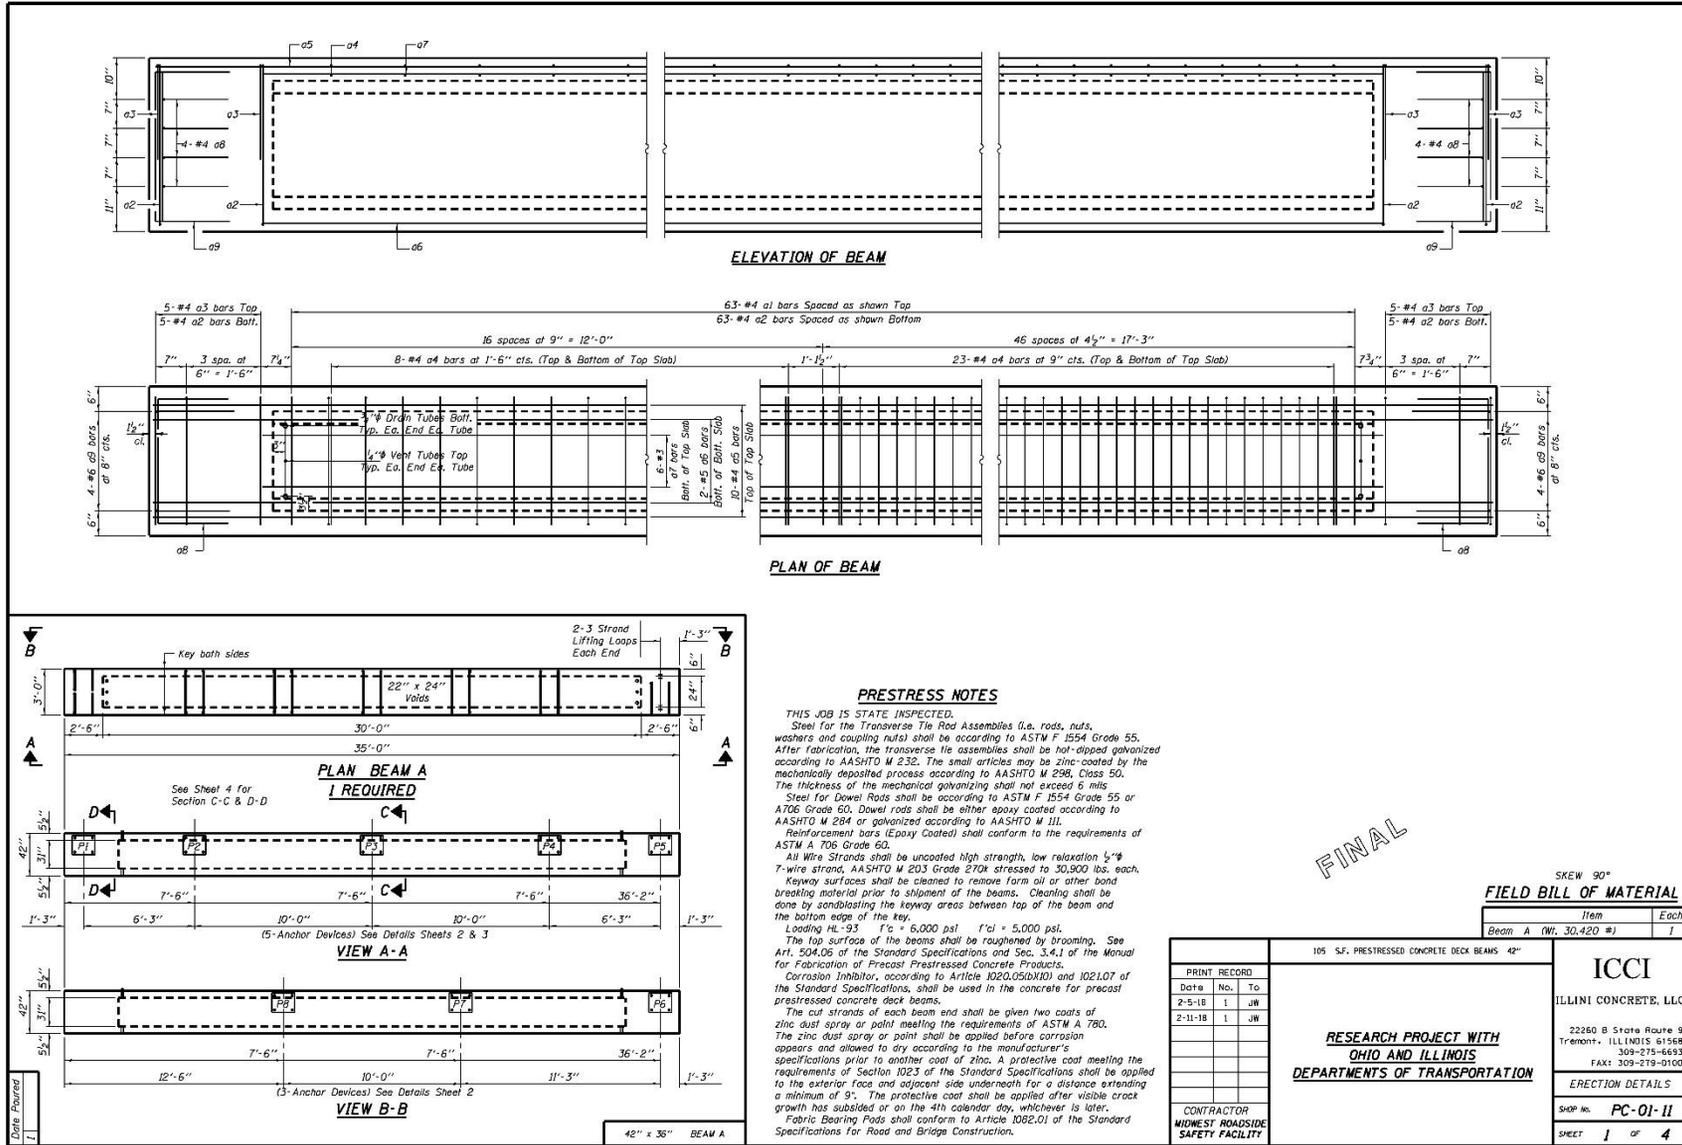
Illini Concrete Box-Beam Girder Details, Sheet 1 of 4
